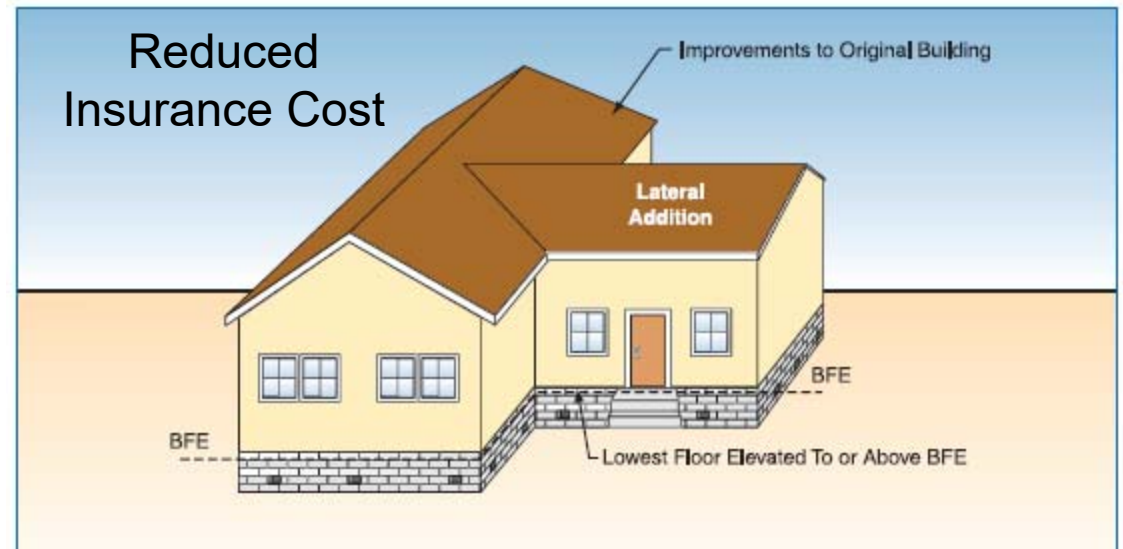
Lateral addition to a pre-FIRM building in an A zone – the proposed work includes an addition and work on the original building, including structural modification of the common wall or roof. The proposed work was determined to be a substantial improvement. The addition complies with all requirements and the building is brought into compliance by elevating it on a compliant foundation.
